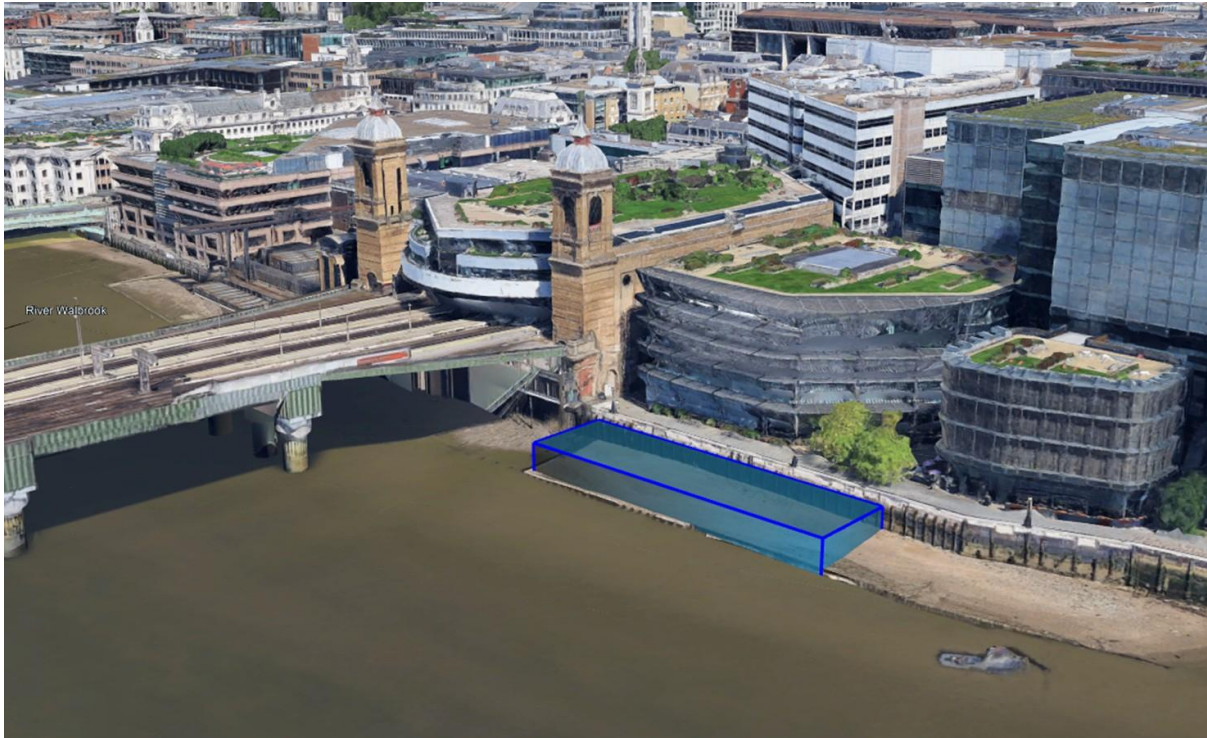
location of static barge (highlighted as blue box) on the Swan Lane foreshore, as seen from the east of Cannon Street Railway Bridge
